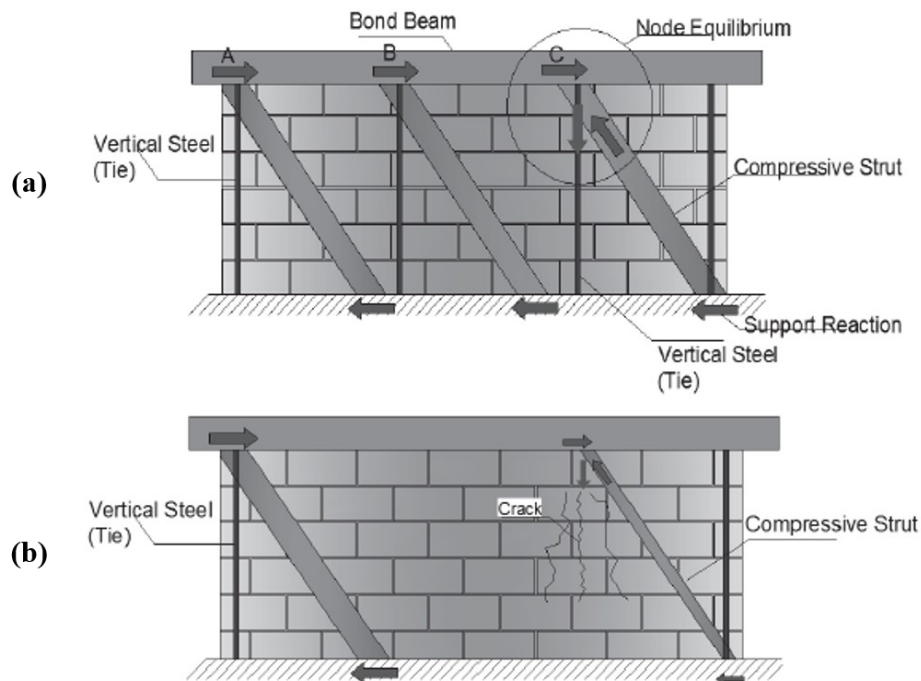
Effect of vertical reinforcement spacing in PG walls (a) with closely spaced reinforcement, and (b) with widely spaced reinforcement (adapted from Hassanli et al., 2014)
